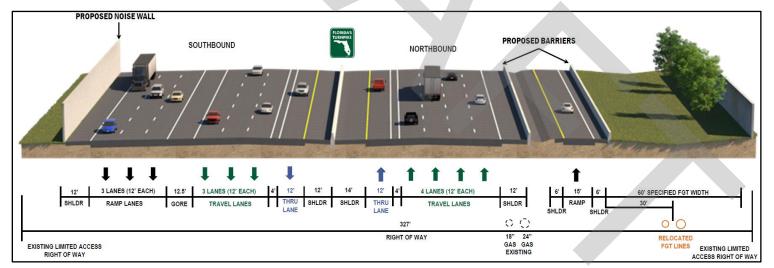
Preferred Alternative Roadway Section between Wiles Road and Sawgrass Expressway
